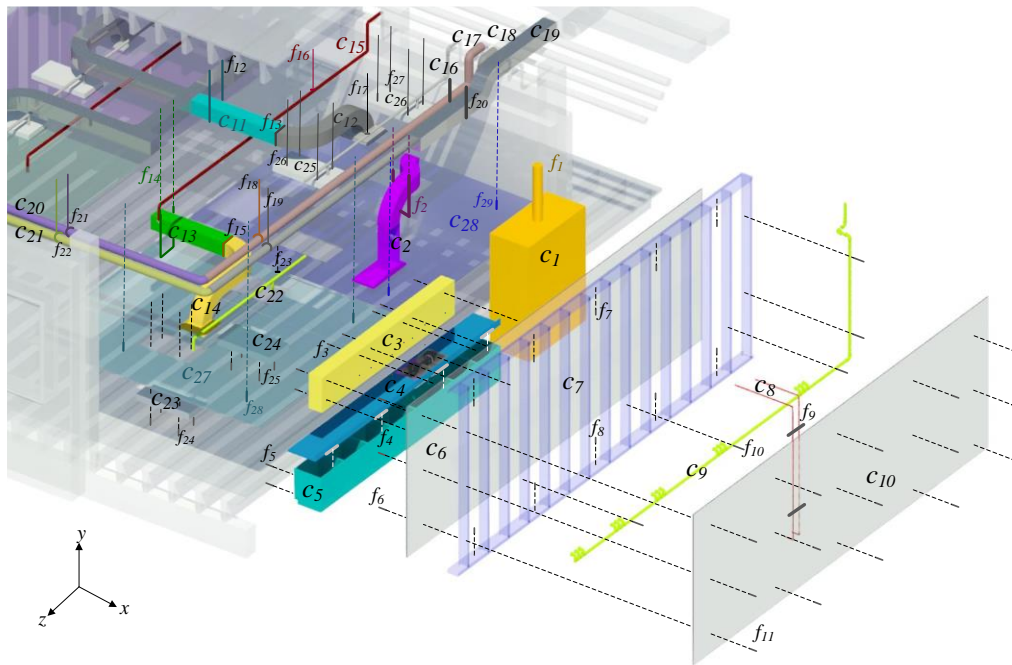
Exploded view of the disassembly model: Cluster 1
